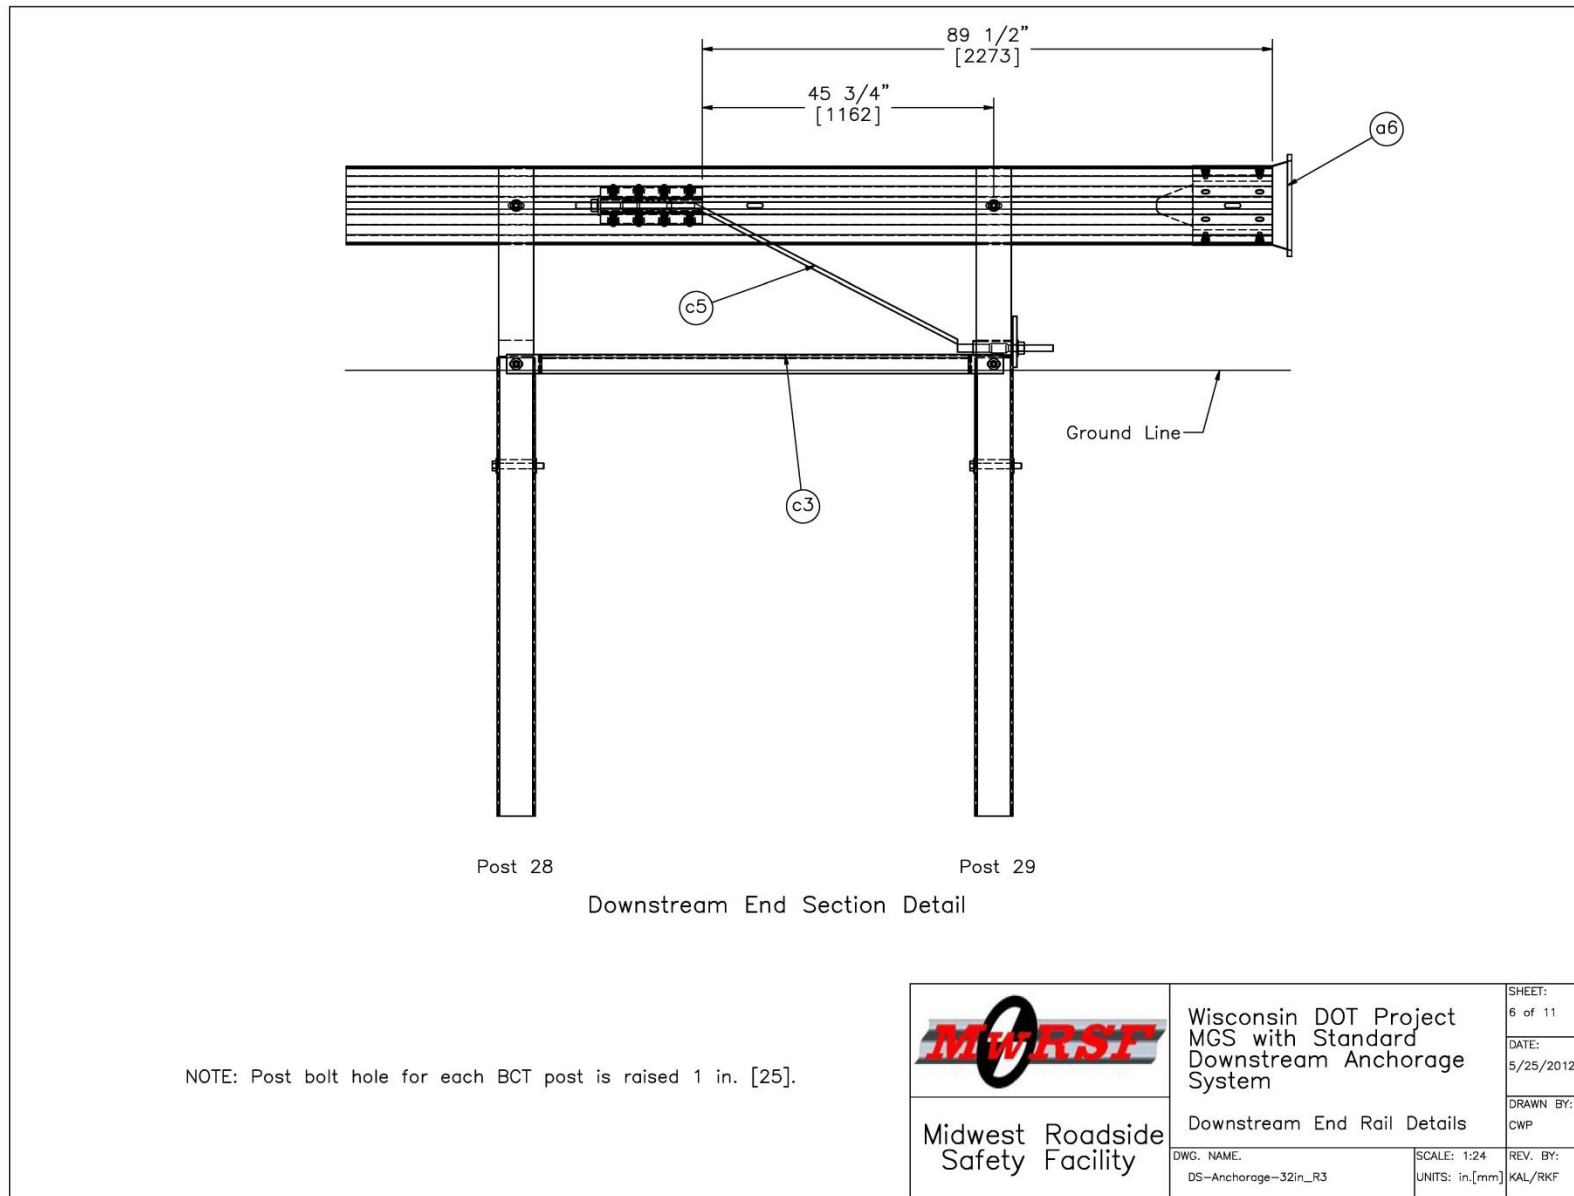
Downstream End Anchor Details, Test No. WIDA-2
